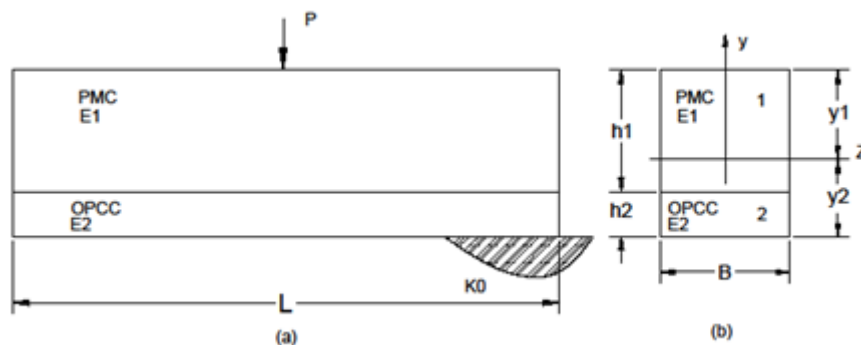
(a) SFRPMC-on-OPCC composite beam with no crack on Winkler foundation; (b) cross-section of composite beam
